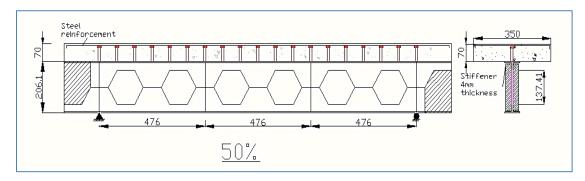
Plan of Composite Castellated Beam (λ=50%)
